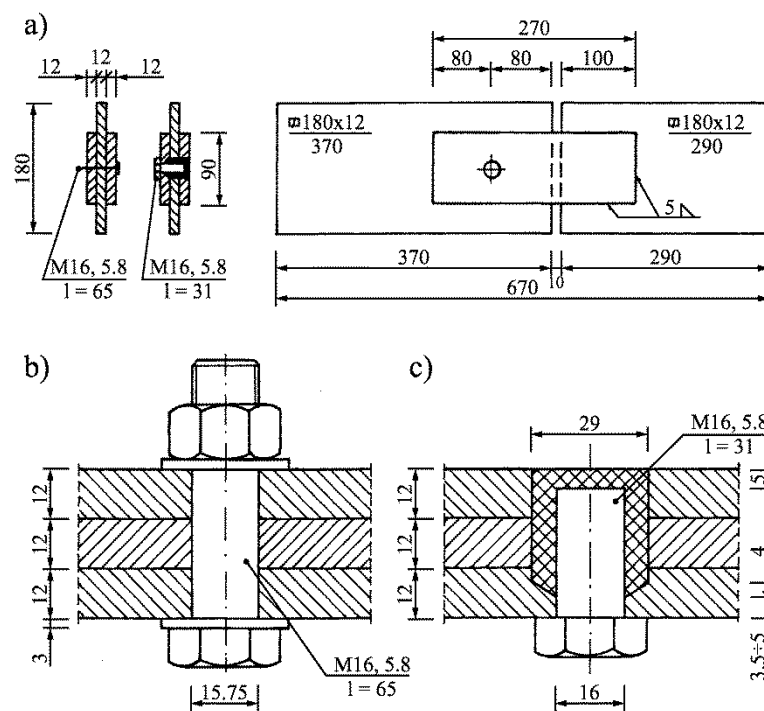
Geometry of specimens for joint testing: a) general alignment, b) fit bolt joint, c) weld stud joint
